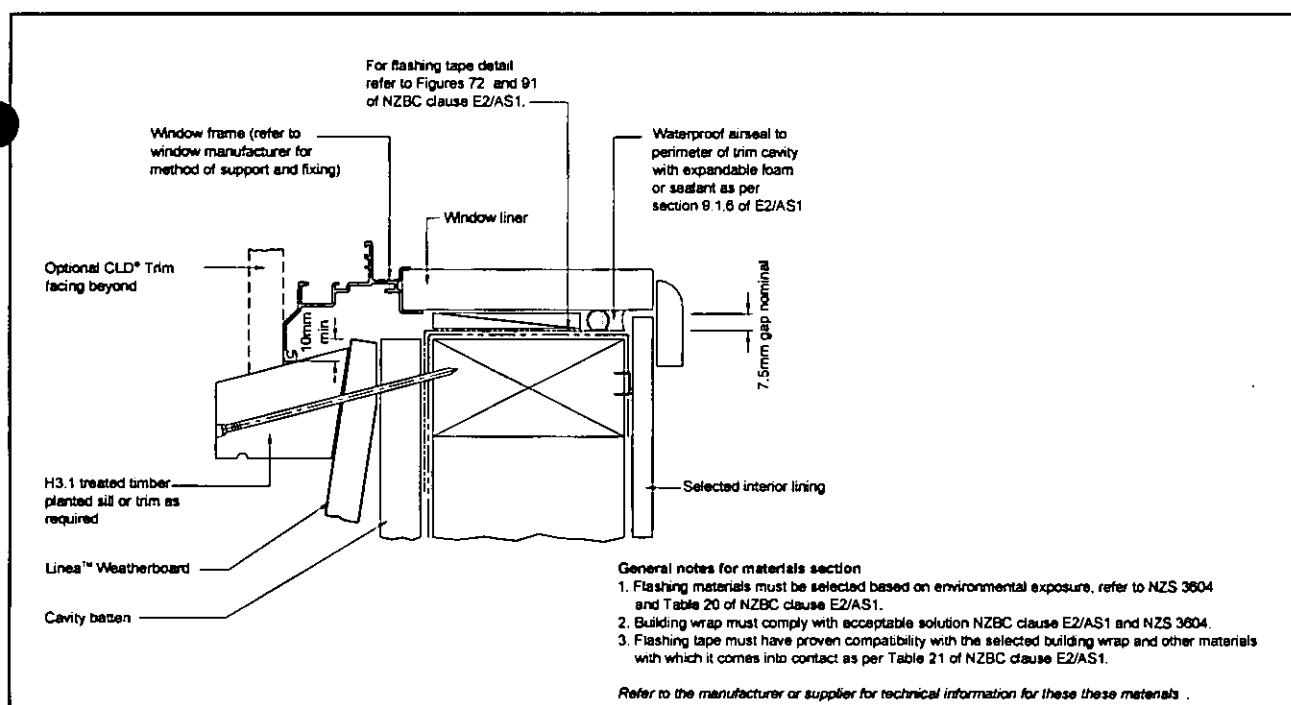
CAVITY WINDOW SILL WITH FACINGS
